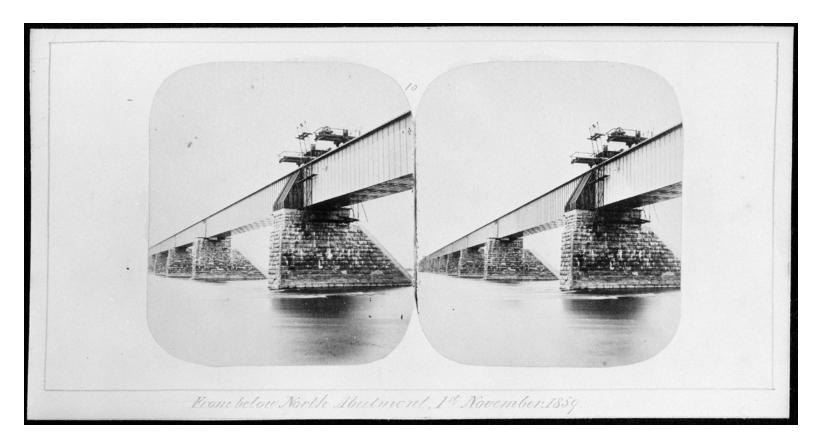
Victoria Bridge under construction, from below North Abutment, 1859.
